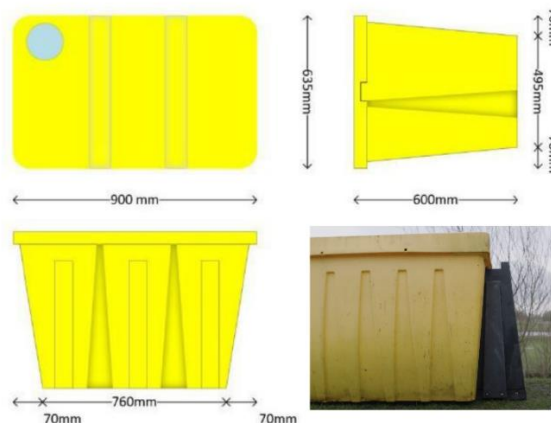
Schematisation of TubebARRIER (Scheel, 2021)
